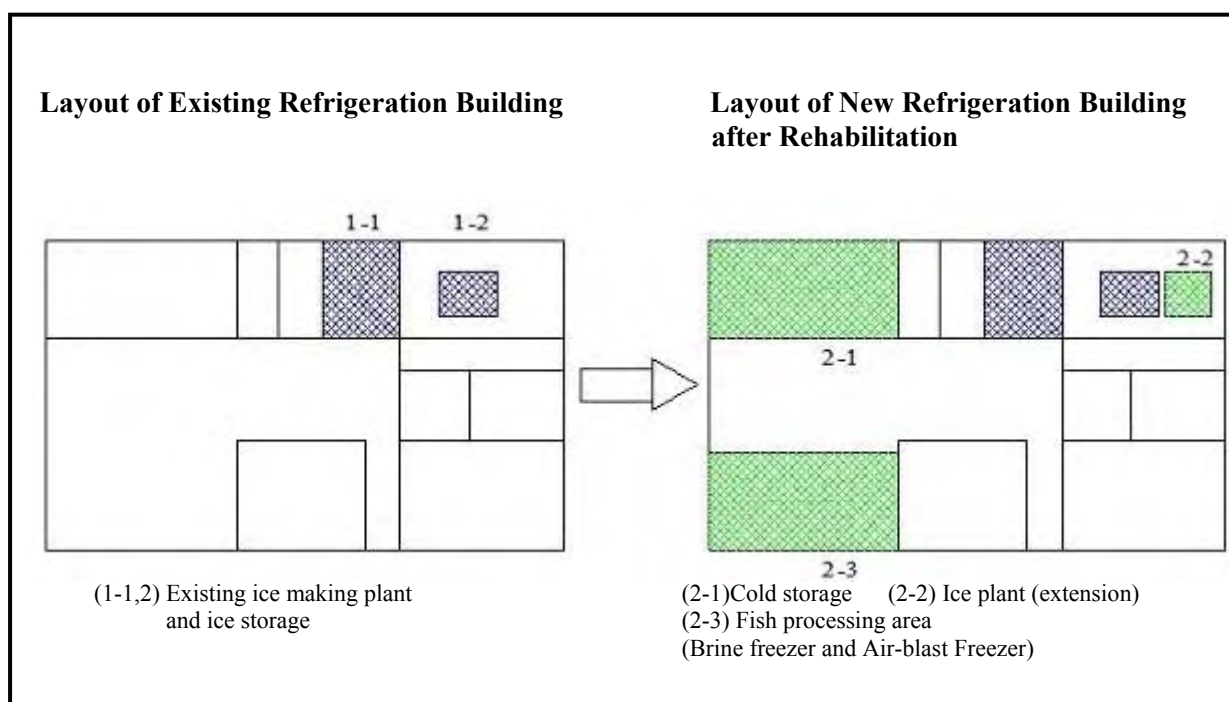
Existing Layout and Proposed Design of Refrigeration Facilities (Sual)
